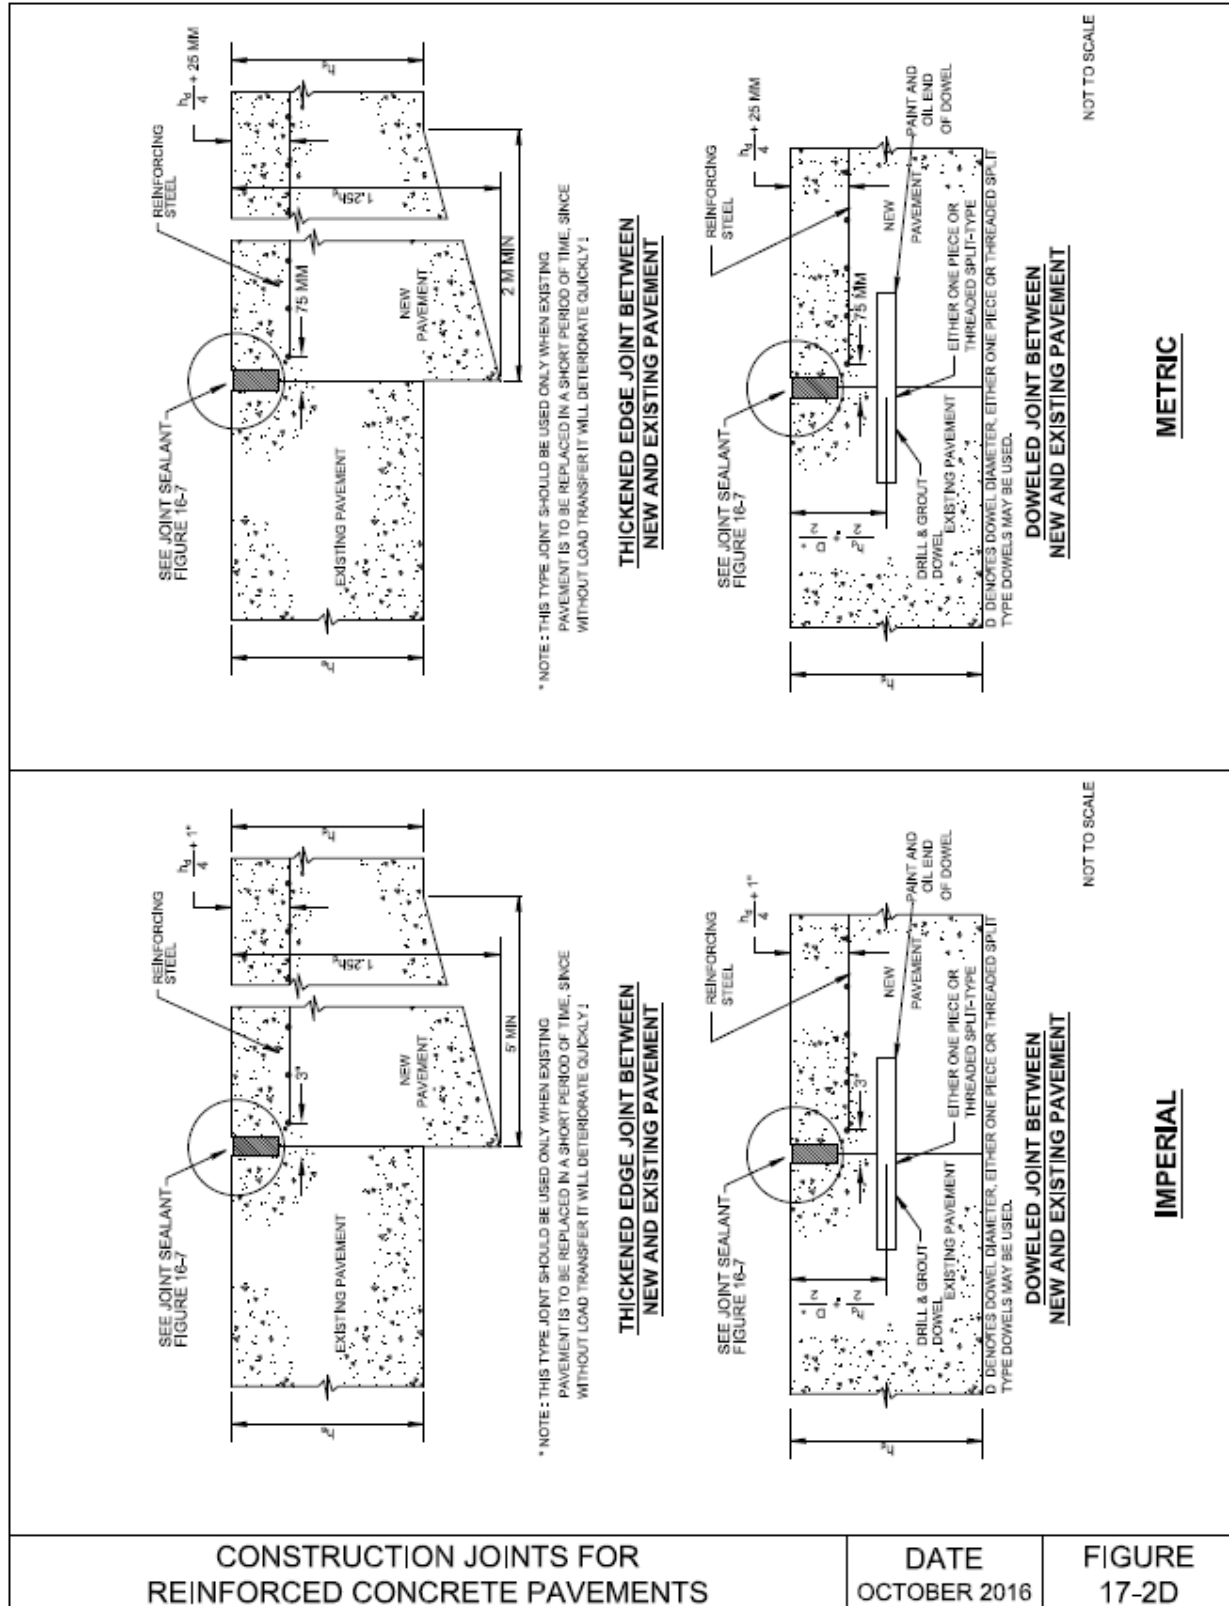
D Construction Joints for Reinforced Concrete Pavements
